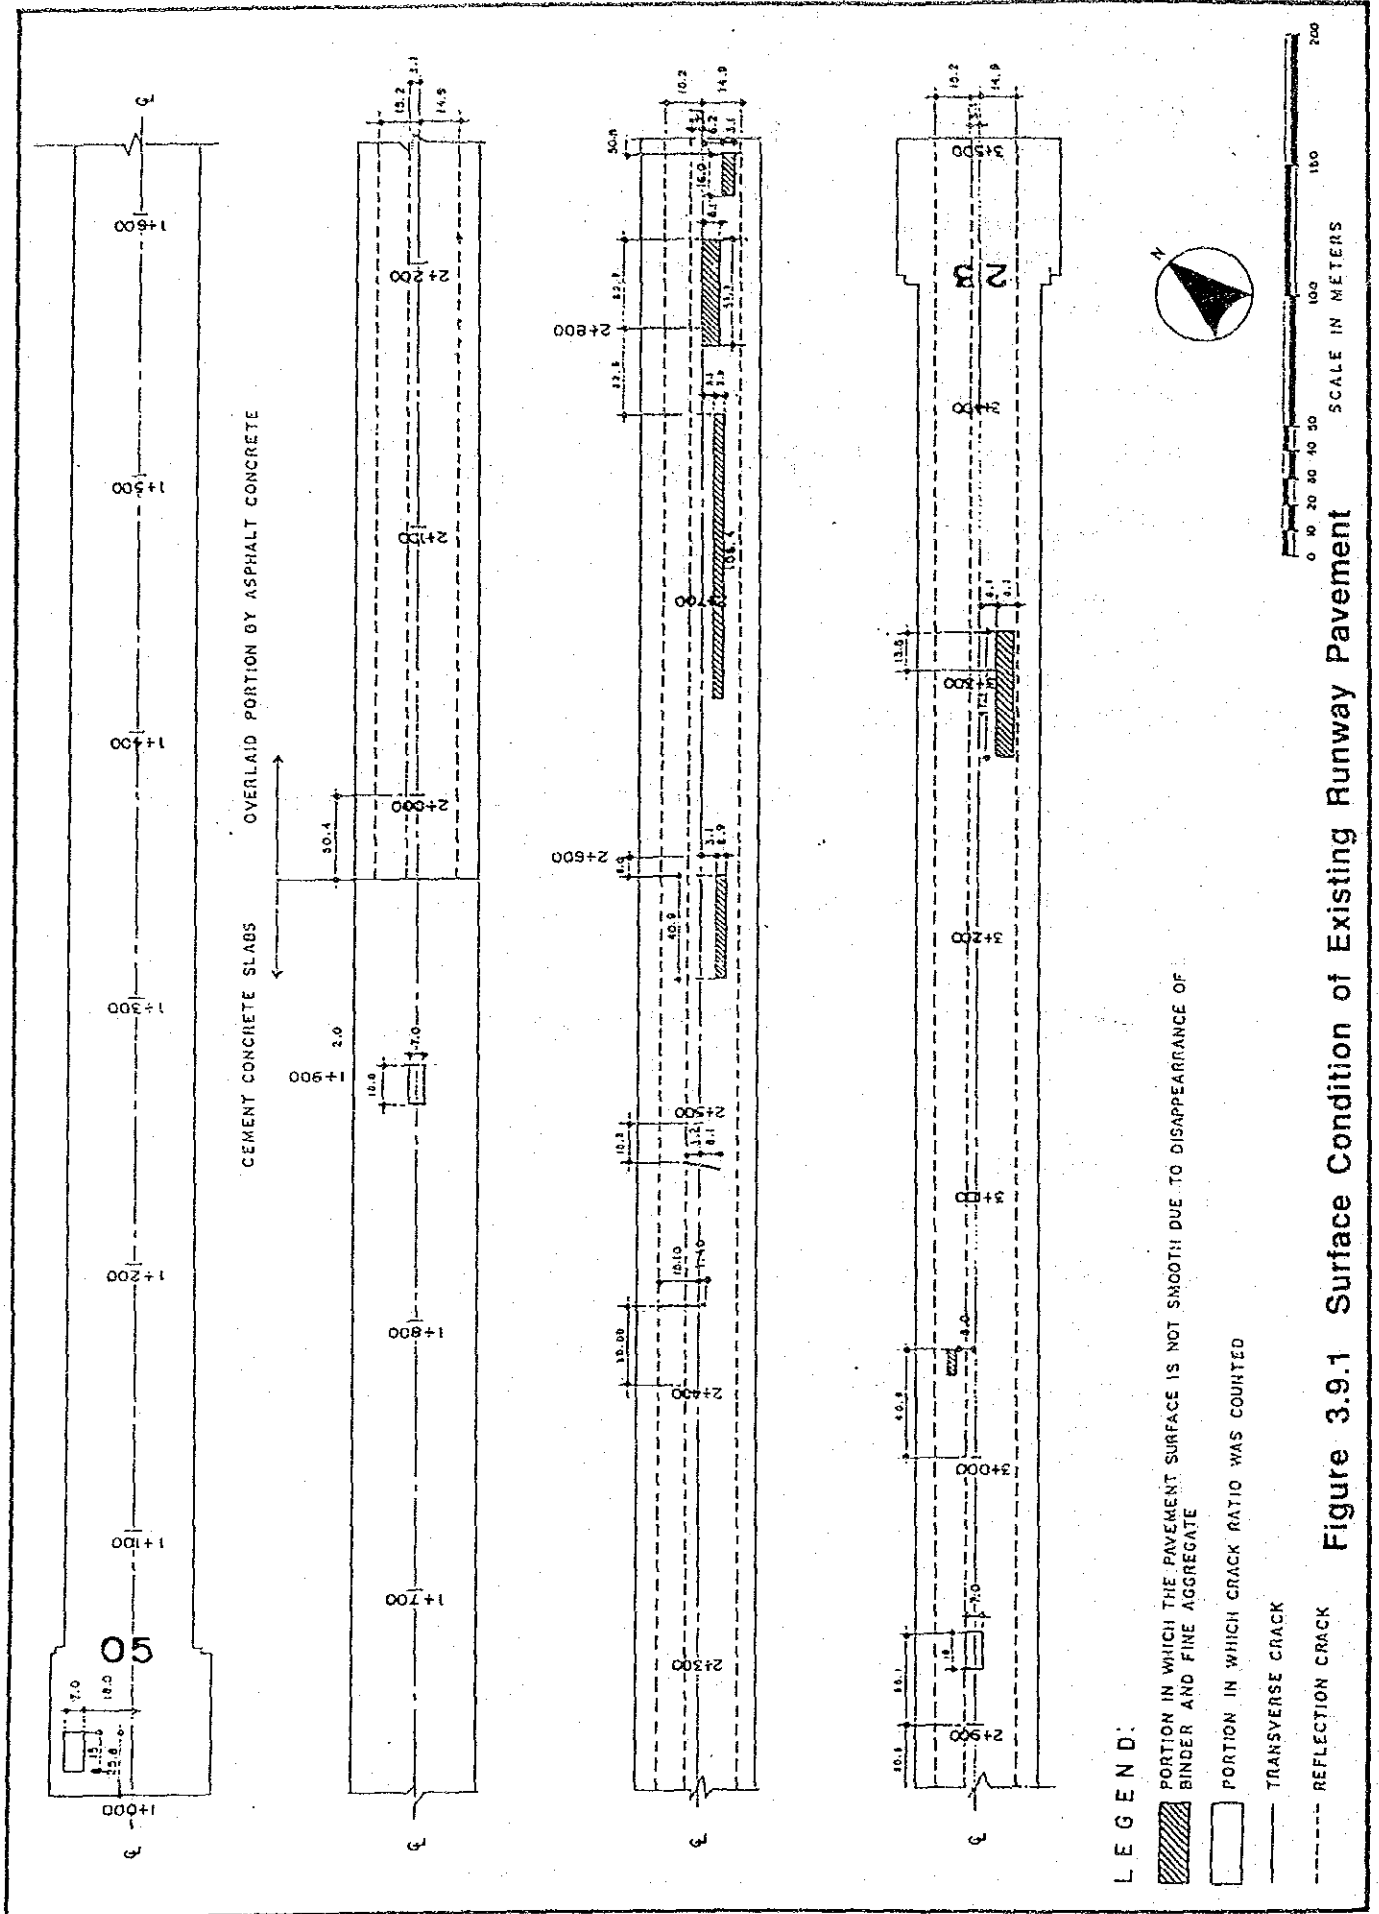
Surface Condition of Existing Runway Pavement
